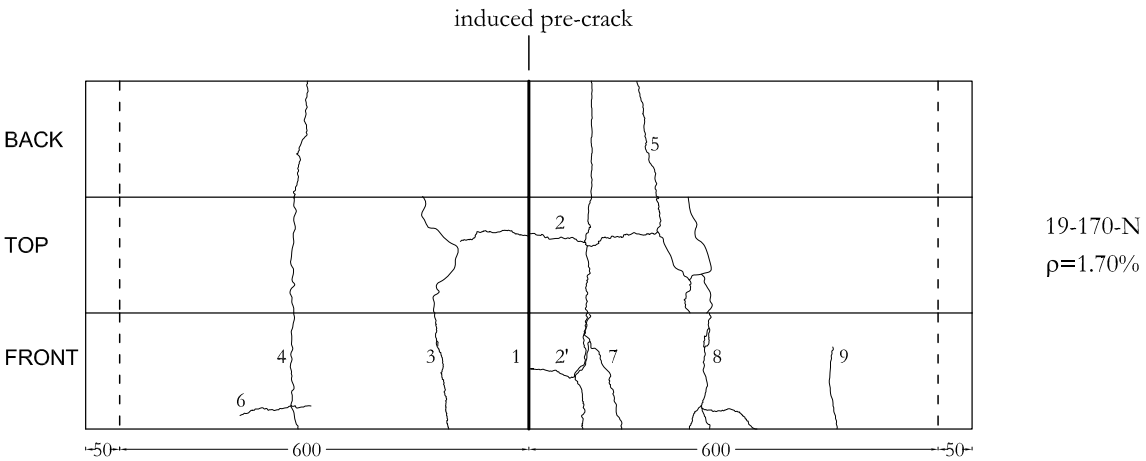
Final crack pattern for 19-170-N tie (units in mm).
